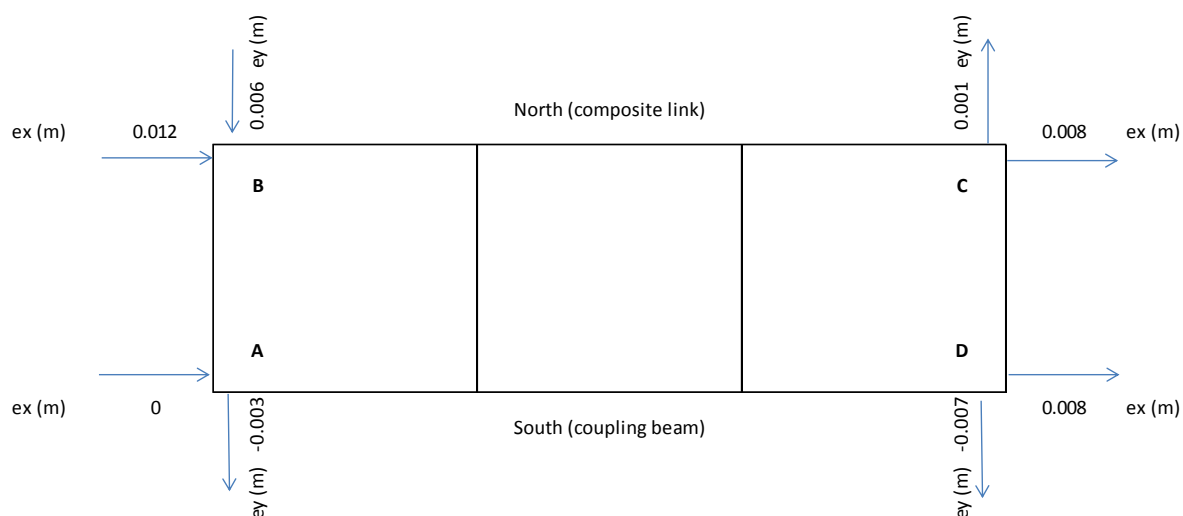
Out of plumb, 3rd measurement, 2nd floor
